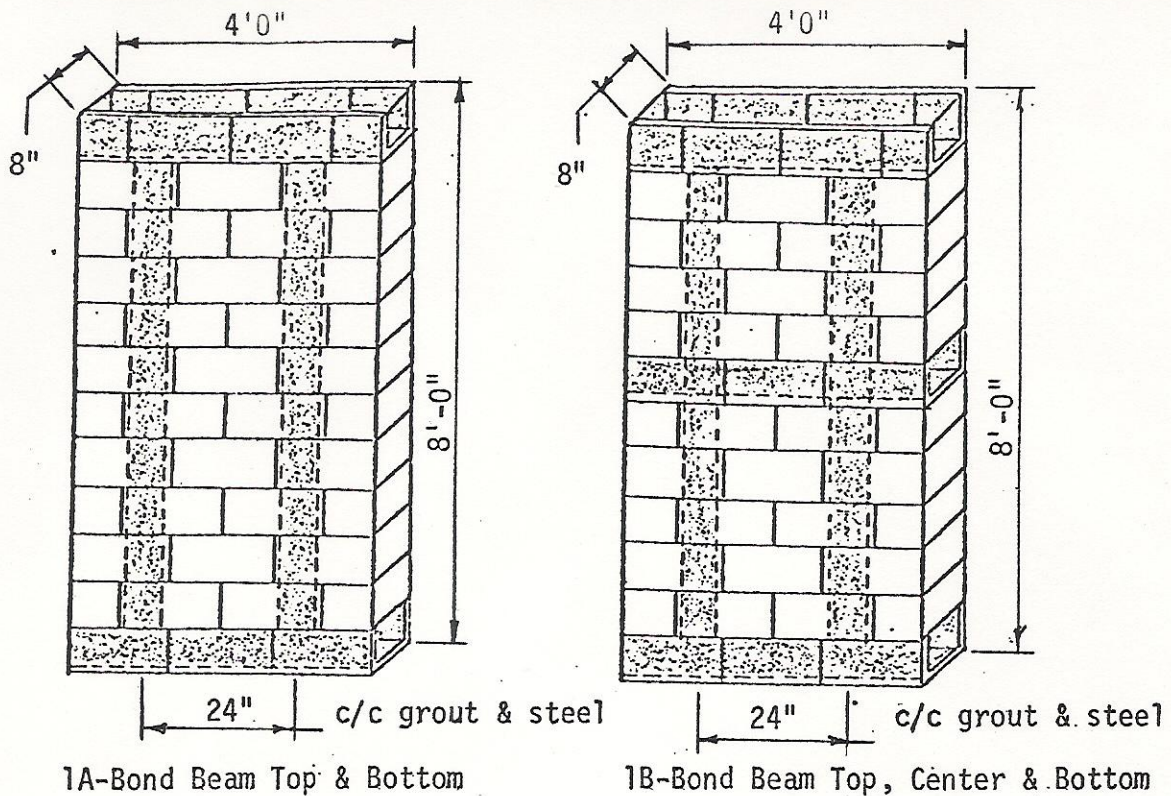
GROUT AND BOND BEAM LOCATIONS FOR THE FLEXURAL WALL SPECIMENS (shaded areas indicated location of grout)
